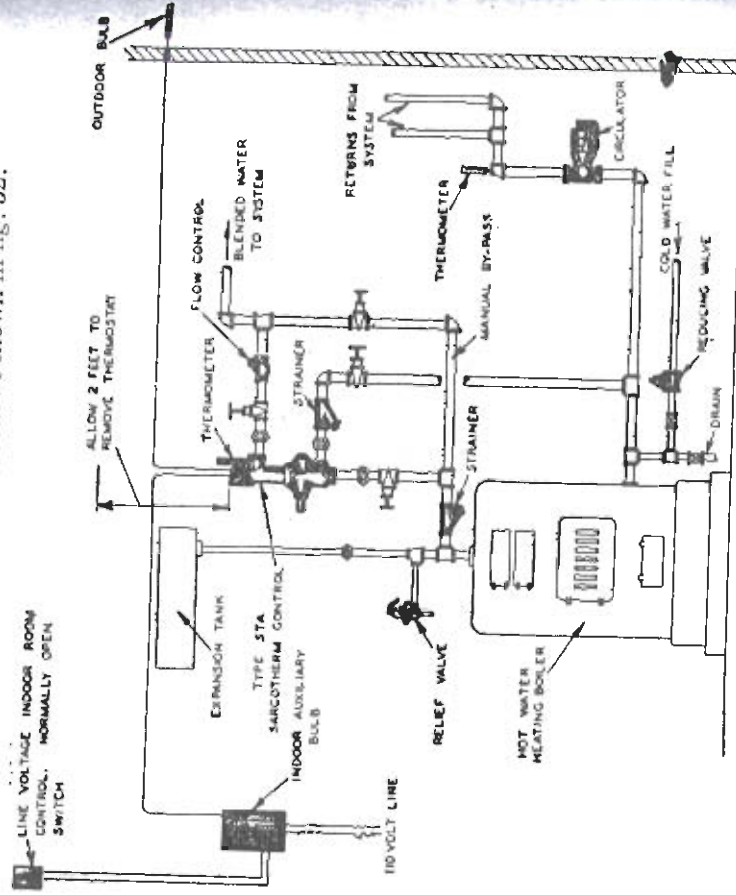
Schematic piping diagram of typical installation featuring Sarcotherm automatic water blender controlled by outdoor thermostat in addition to compensating indoor control bulb.
